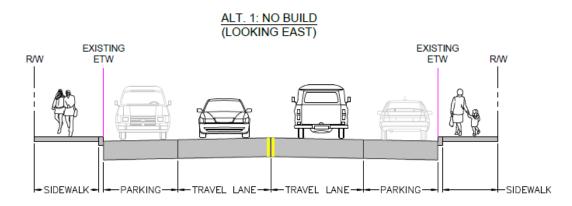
Coleman Avenue (City of Menlo Park) Alternative 1
